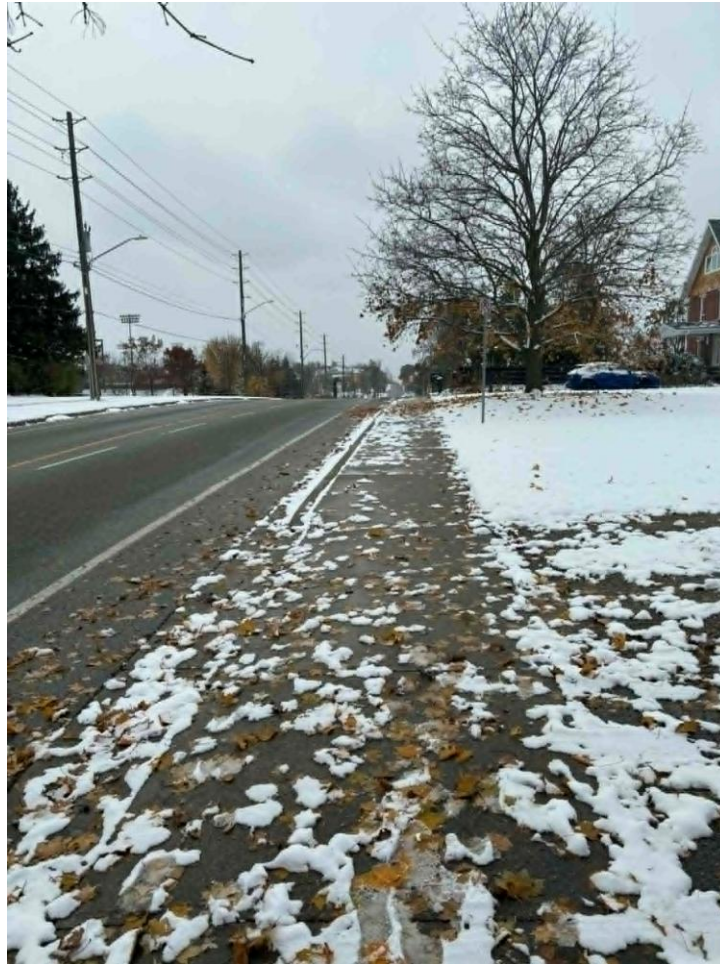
Proposed Site Driveway Location Looking Right (West)
